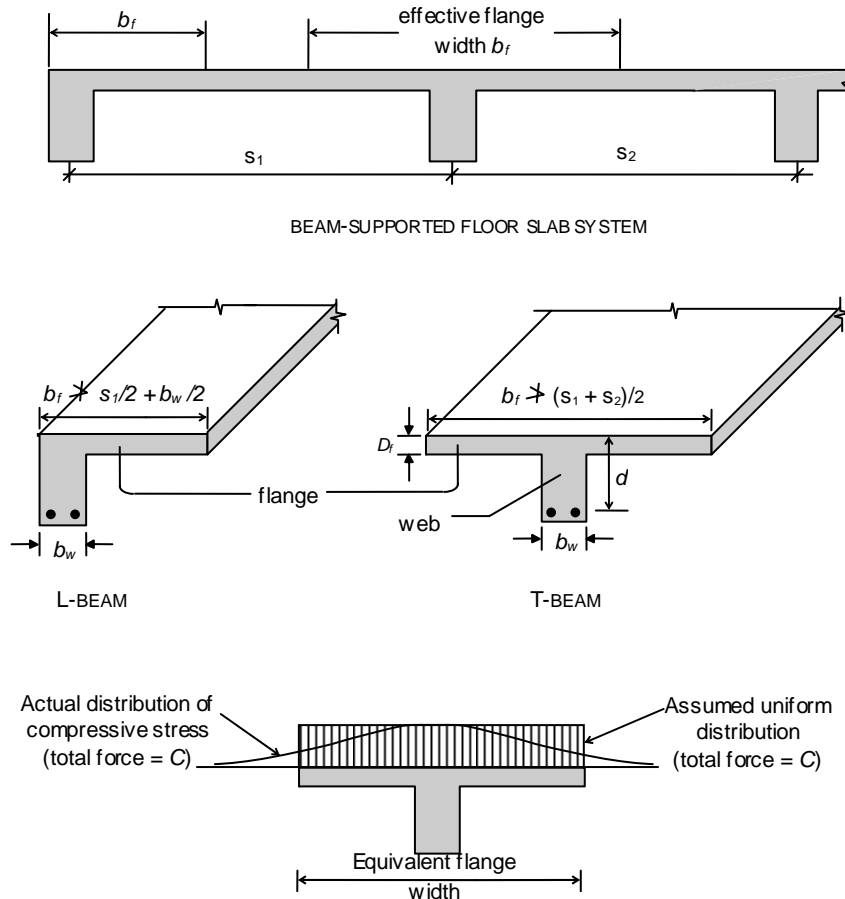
T-beams and L-beams in beam-supported floor slab systems
